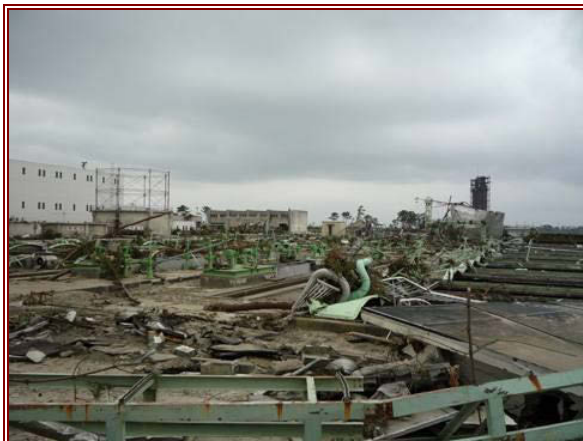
(left) Damage to Minami Gamou Sewage Treatment Plant (Sendai City, 2011b).
